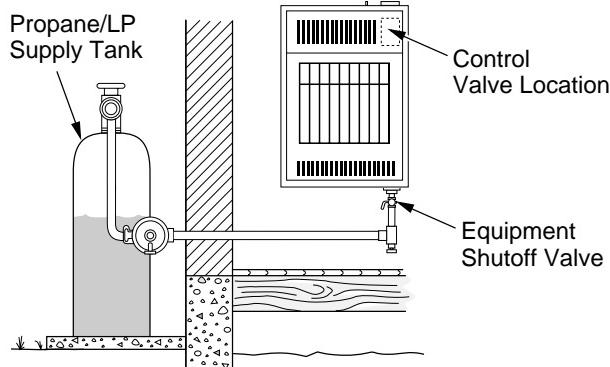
Checking Gas Joints for Propane/LP Gas [6,000 Btu/Hr Model (1.8 kW) Shown]
